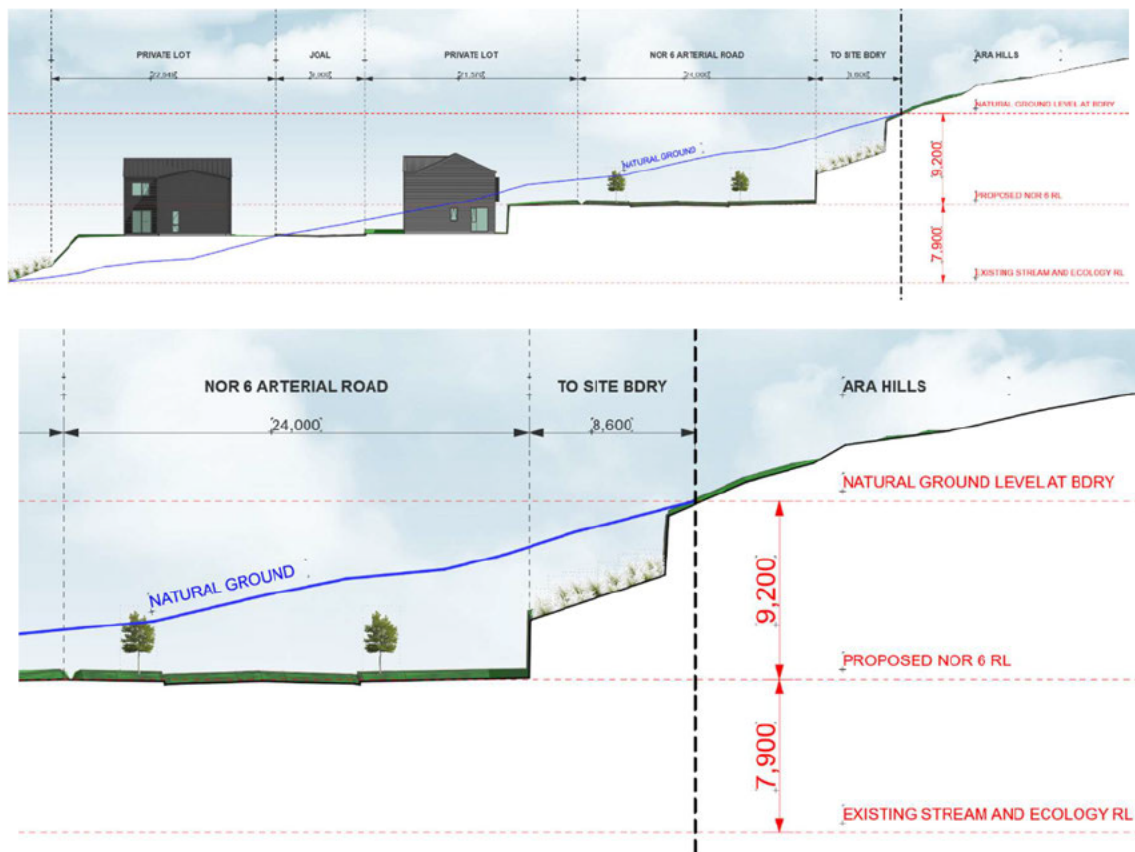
Cross section highlighting the level difference between existing streams, the proposed NOR 6 arterial road, and the natural ground level at the northern site boundary.
